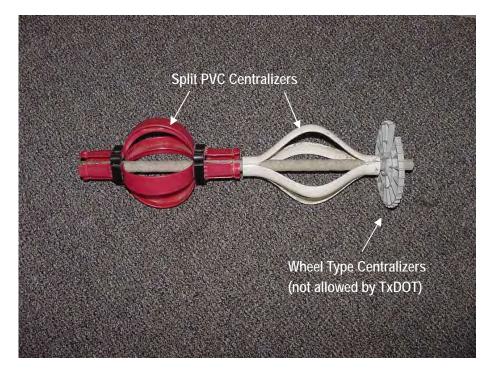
Split PVC and Wheel Type Centralizers Used in Soil Nail Installations
